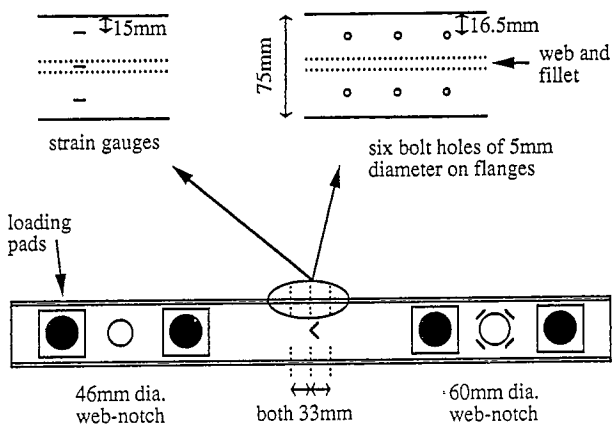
Location of six closed bolt holes on the tensile and compressive flanges and two web cutouts on notched I-beams. The strain gauge positions are identified.
